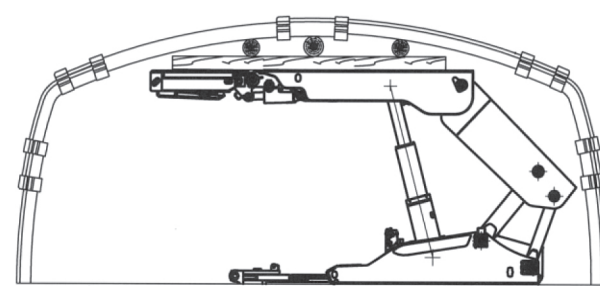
Six-element ŁPrP frame with an installed powered support unit
